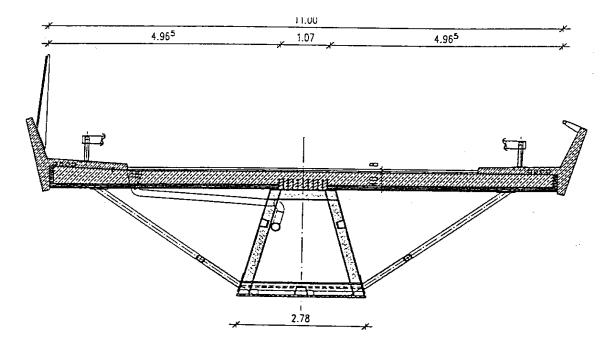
Bridgebuilding with heavy plates, box beam section of Nesebachtal-bridge, D
